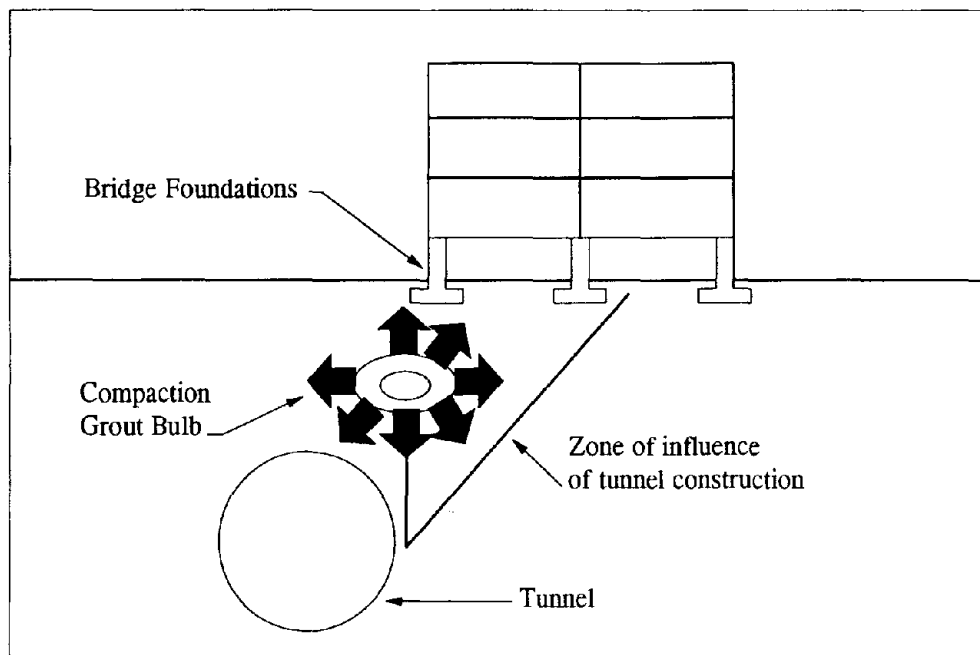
Prevention of tunnel induced settlements using compaction grouting.
